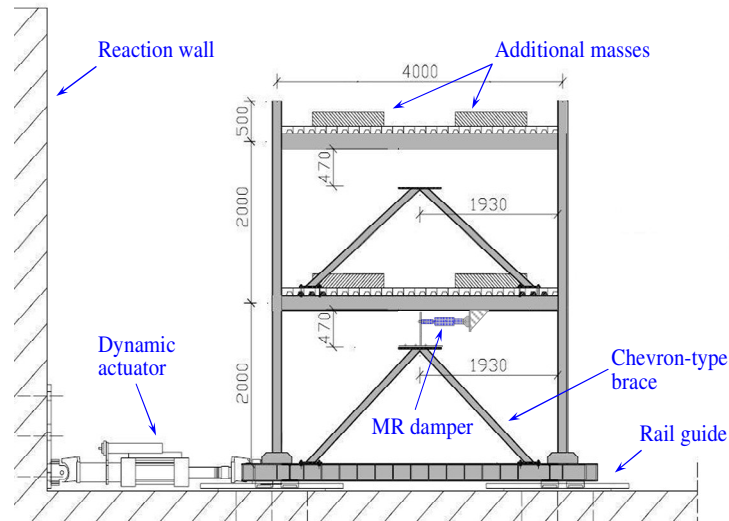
Experimental setup, with dimensions expressed in millimeters.
